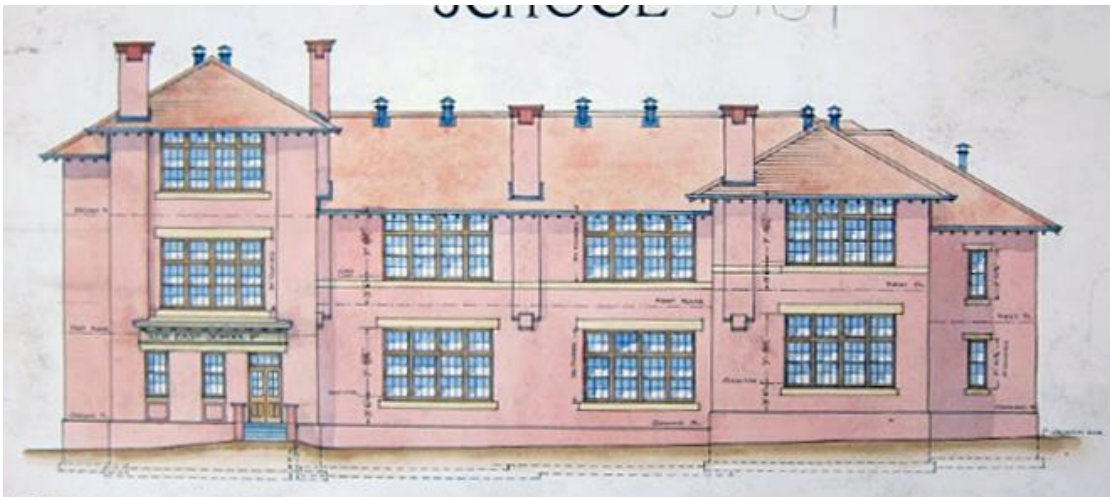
South (Kitchener Street) elevation, 1922 (Source: VPRS 3686/P6/3096)
